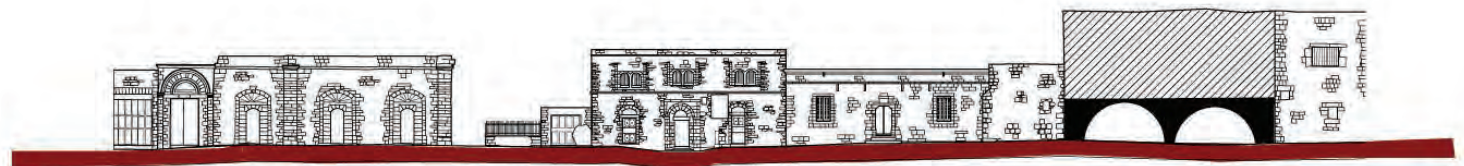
Elevations of the Pilgrimage Route, part 5
